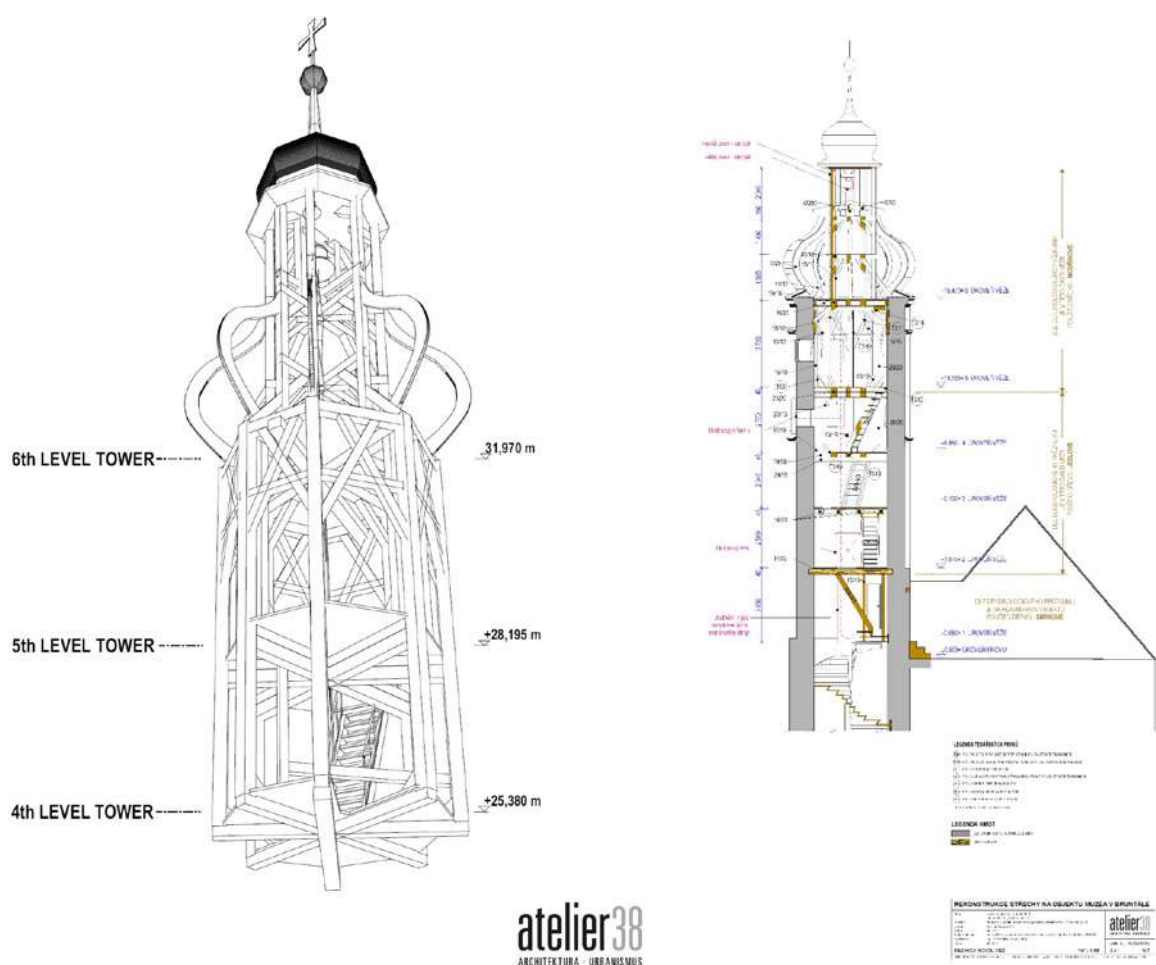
Clock Tower, construction scheme of timber structure. (Drawing, Jakub Sollich, Atelier 38).
